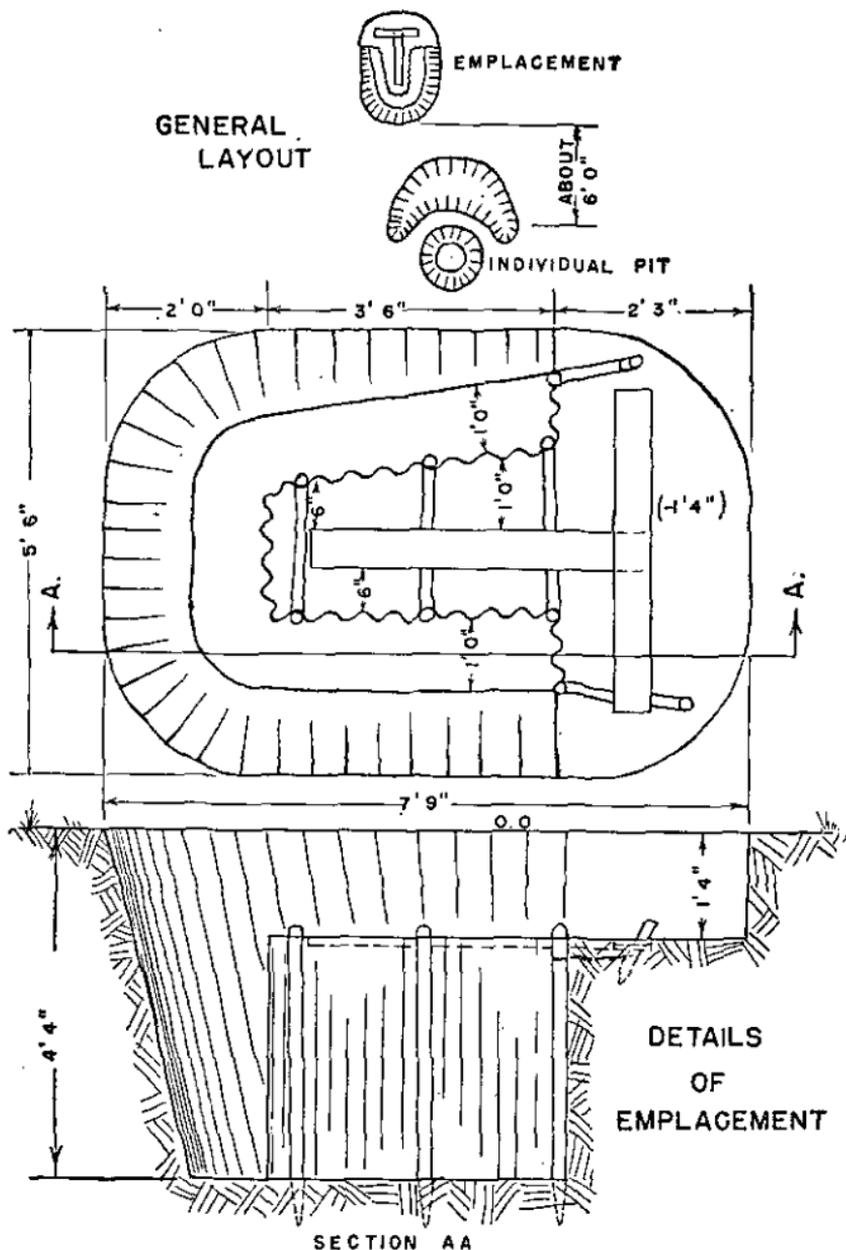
Open, standing emplacement for heavy machine gun (T-base may be omitted).
